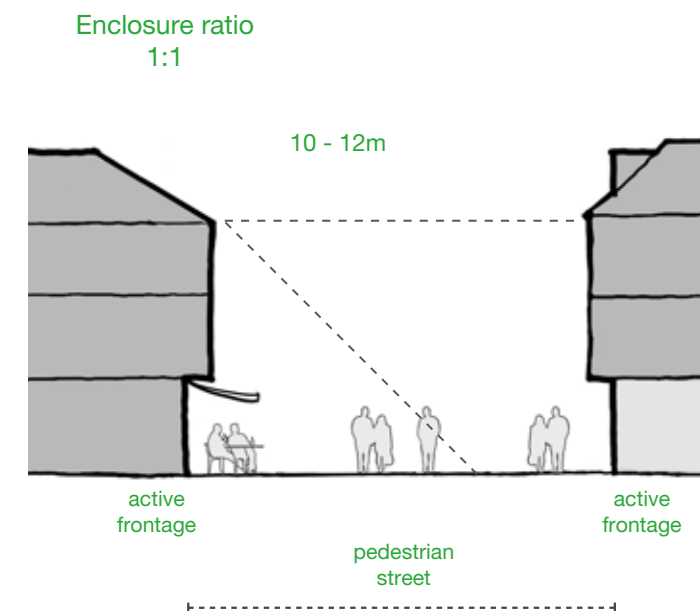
Typical street section of pedestrian street in Lichfield City Centre area
